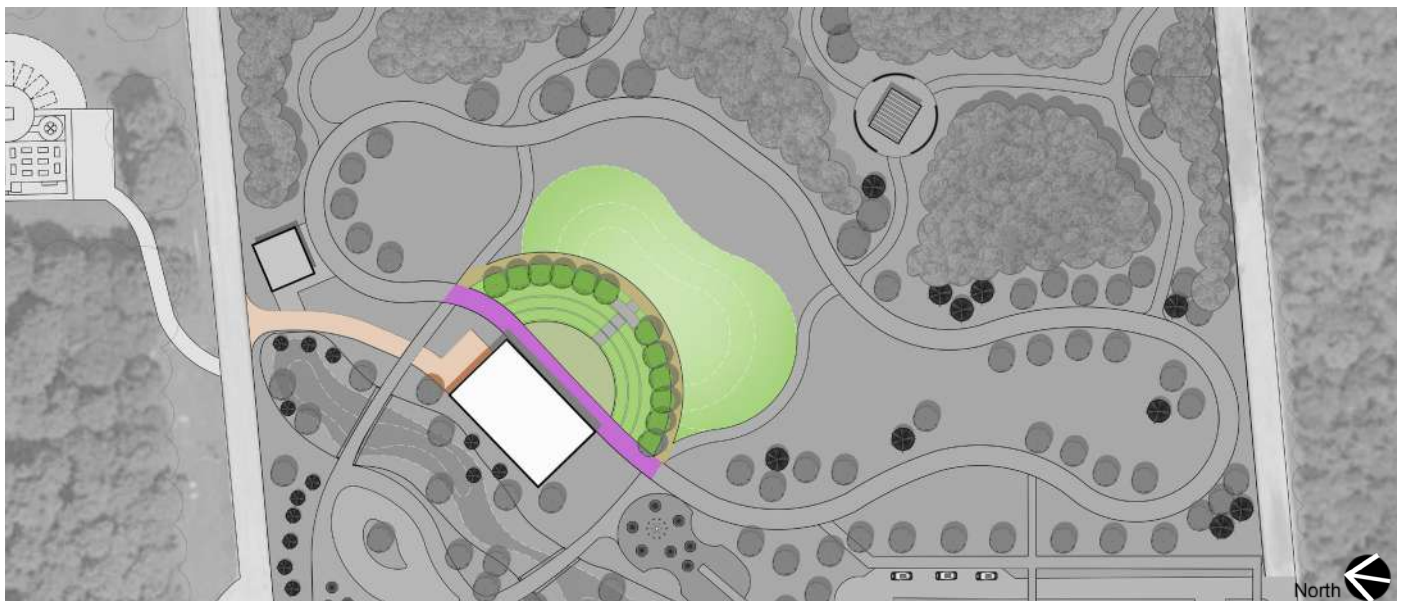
Master Plan Concept Design for outdoor Amphitheatre seating and Pavilion Improvements
